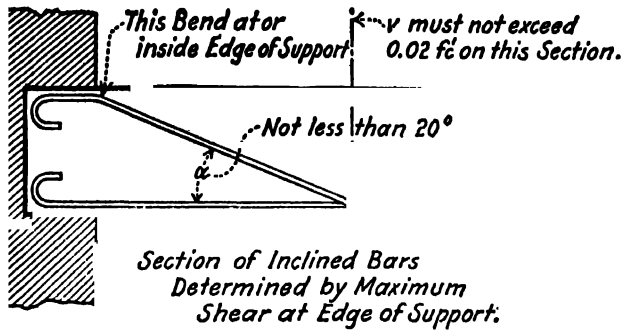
Typical beam with web reinforced by means of bars bent up in single plane.
